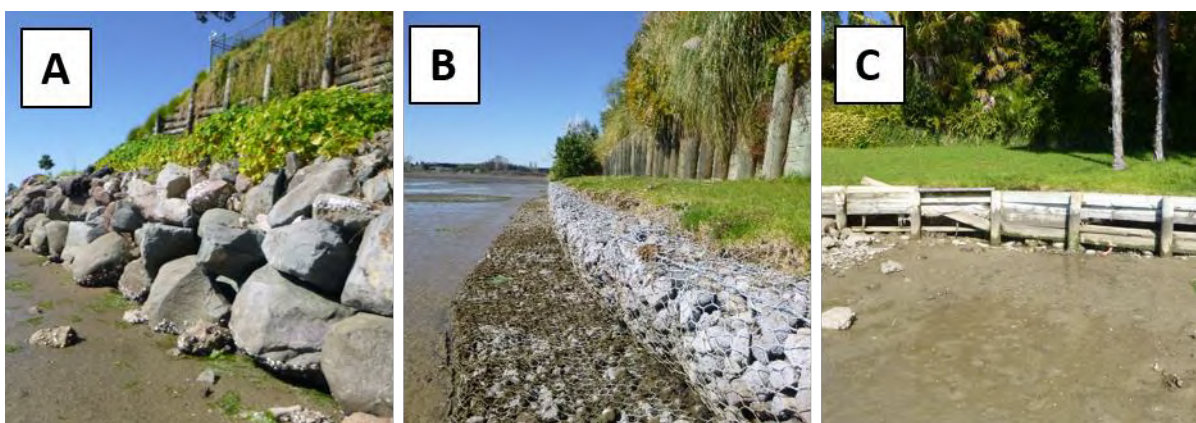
Examples of coastal protection structures around Te Puna West. (A) Large revetment below retaining walls (Cell 8C), (B) gabion baskets (8C), (C) timber wall (8E).
